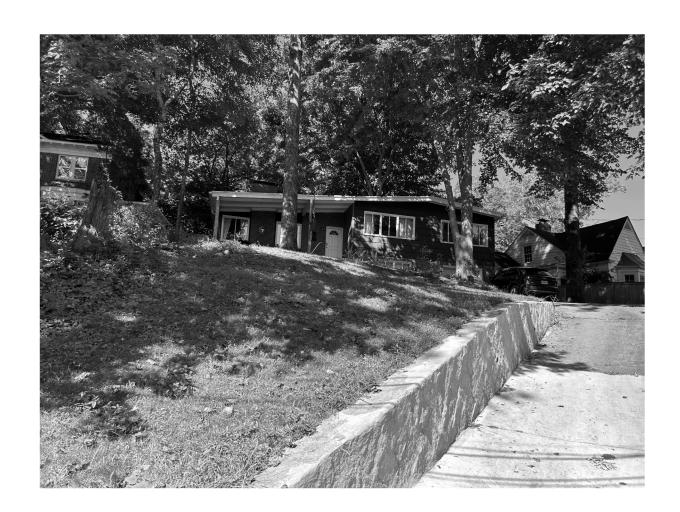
PHOTO OF THE STREET ELEVATION OF EXISTING RESIDENCE - FROM SIDEWALK
